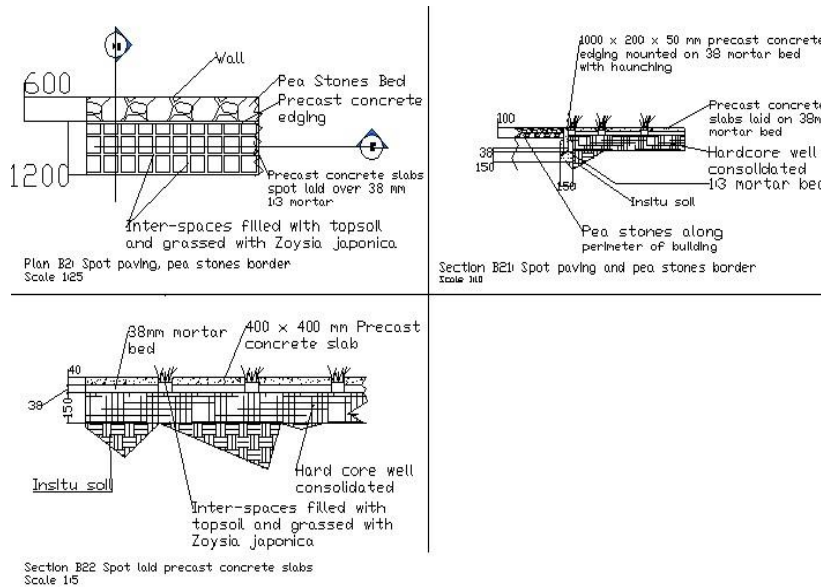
12: Detailing LLSite2 B2 - Paving Slabs and border
